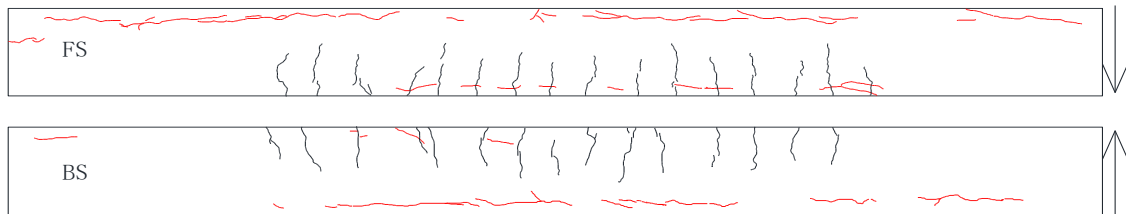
Cracking situation on C1 beam at 29 months
